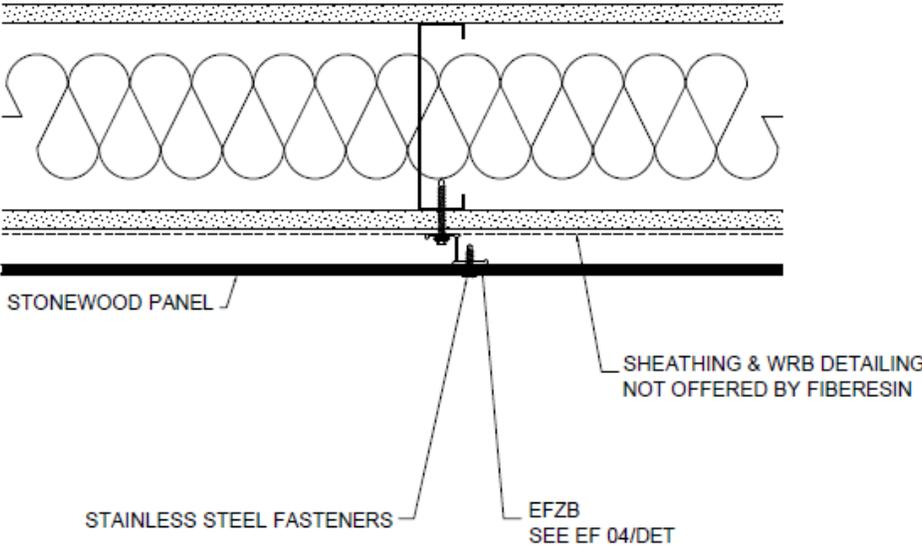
STONEWOOD EXTERIOR ARCHITECTURAL PANELS EXPOSED FASTENER SYSTEM DETAILS VERTICAL PANEL JOINT WITH Z-CHANNEL (EFZB)
